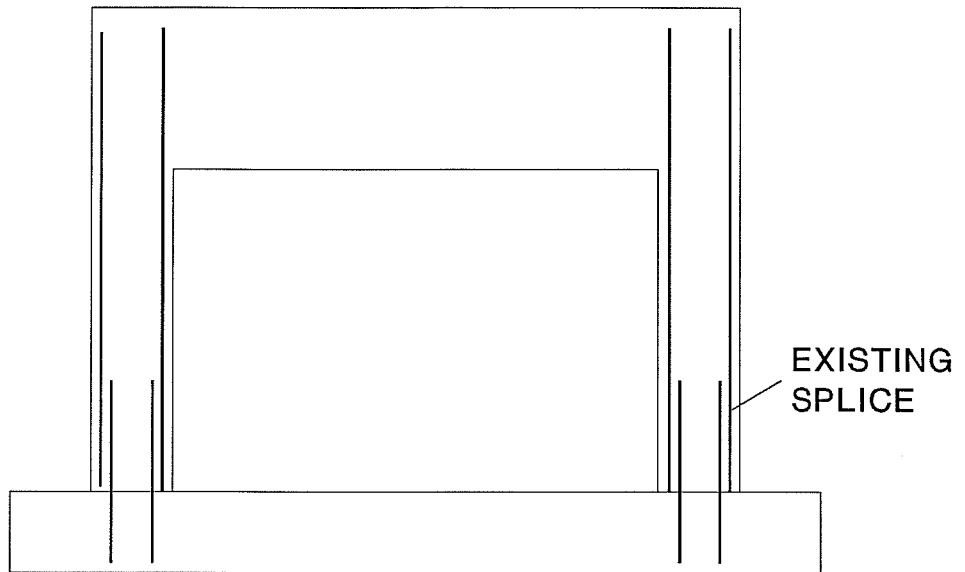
Vertical reinforcement schmatic of Gaynor's specimens.
